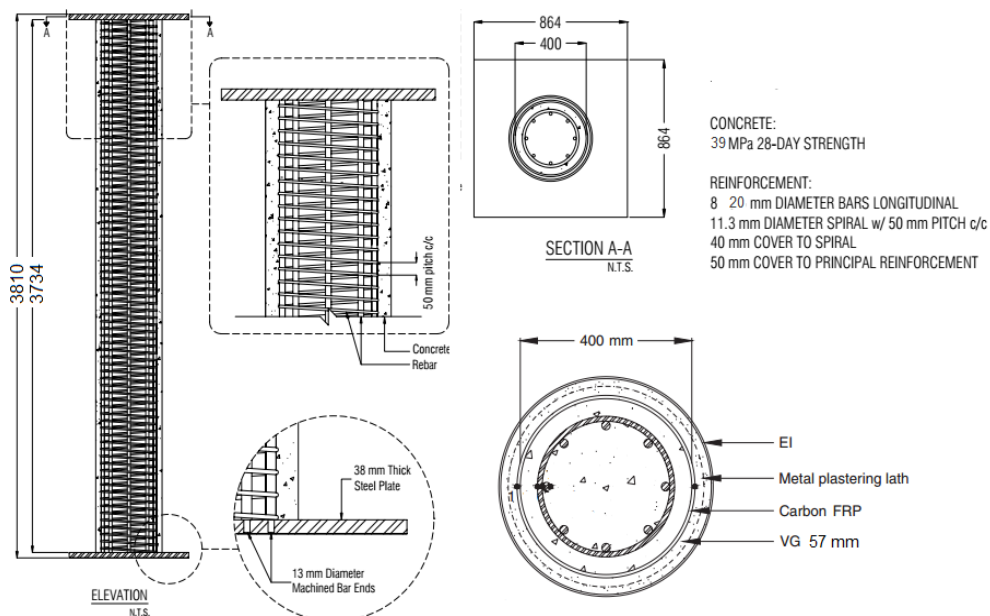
Column (2): Column Dimensions and Reinforcement Details [6]
